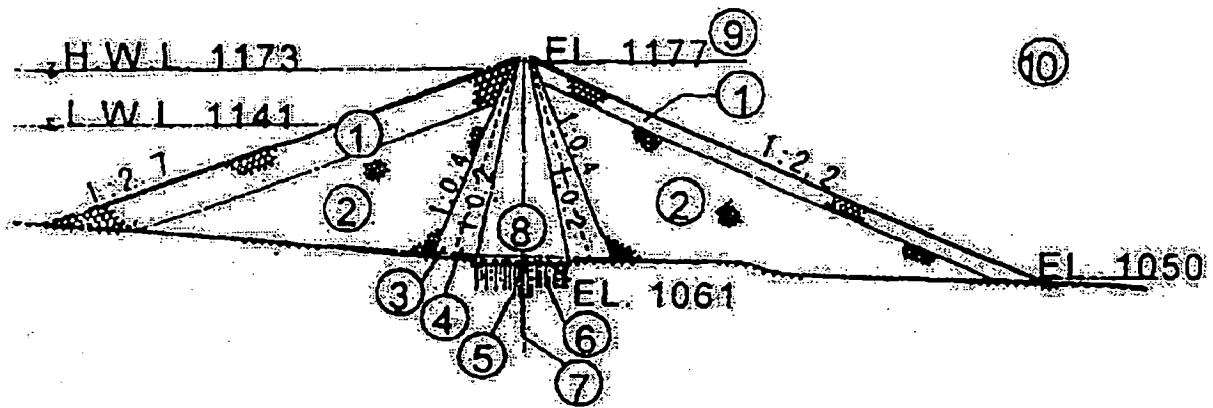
(a). Typical Cross Section of Tahamara Dam
